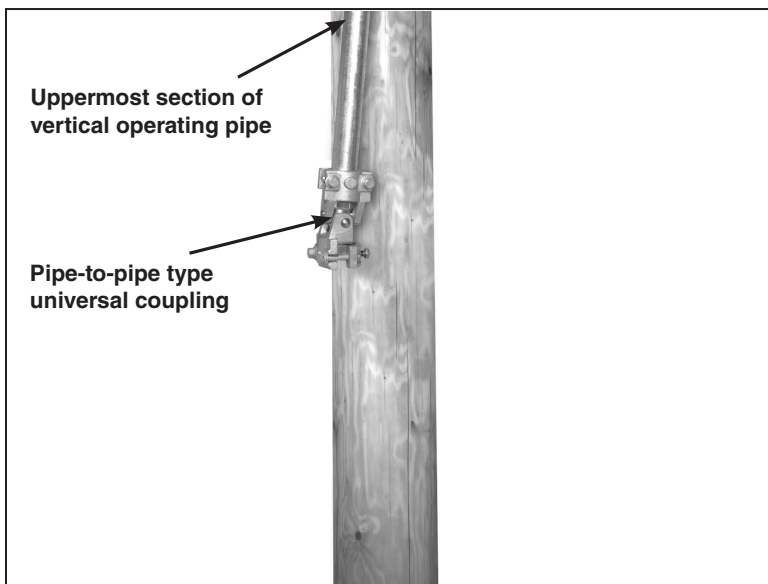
Attach the pipe-to-pipe type universal coupling to the lower end of the vertical operating pipe.
